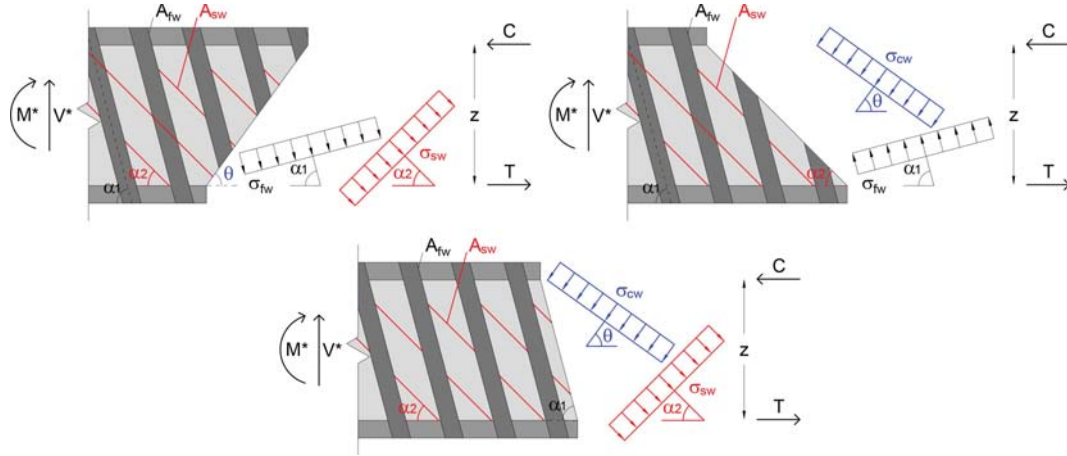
Different beam segments identified through three sections parallel to stress field direction of: concrete strut (a); steel stirrups (b); FRP reinforcement (c).
